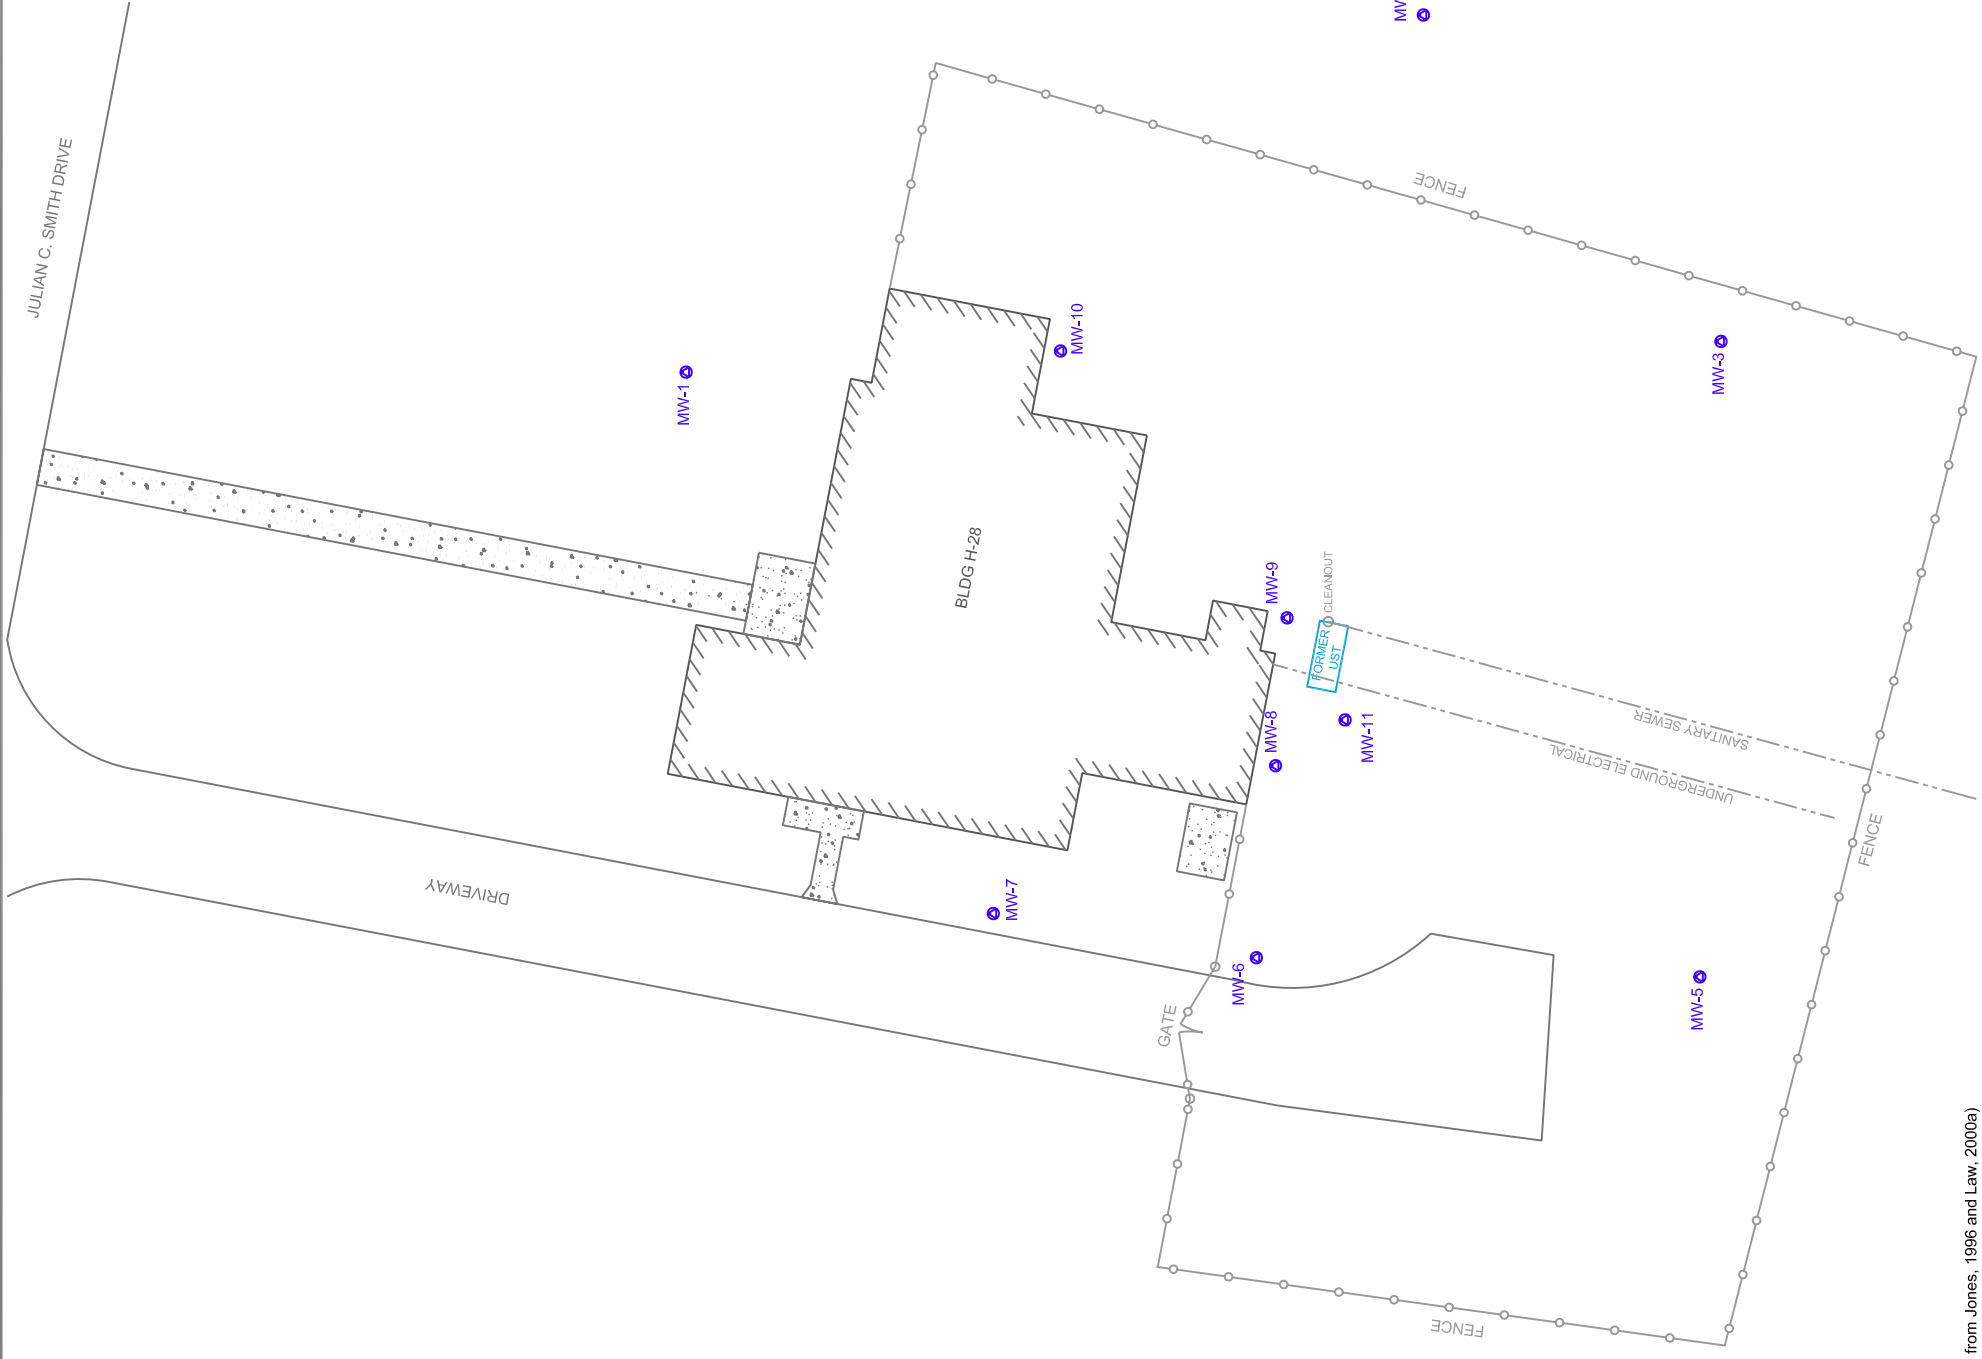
SITE LAYOUT AND WELL LOCATIONS
